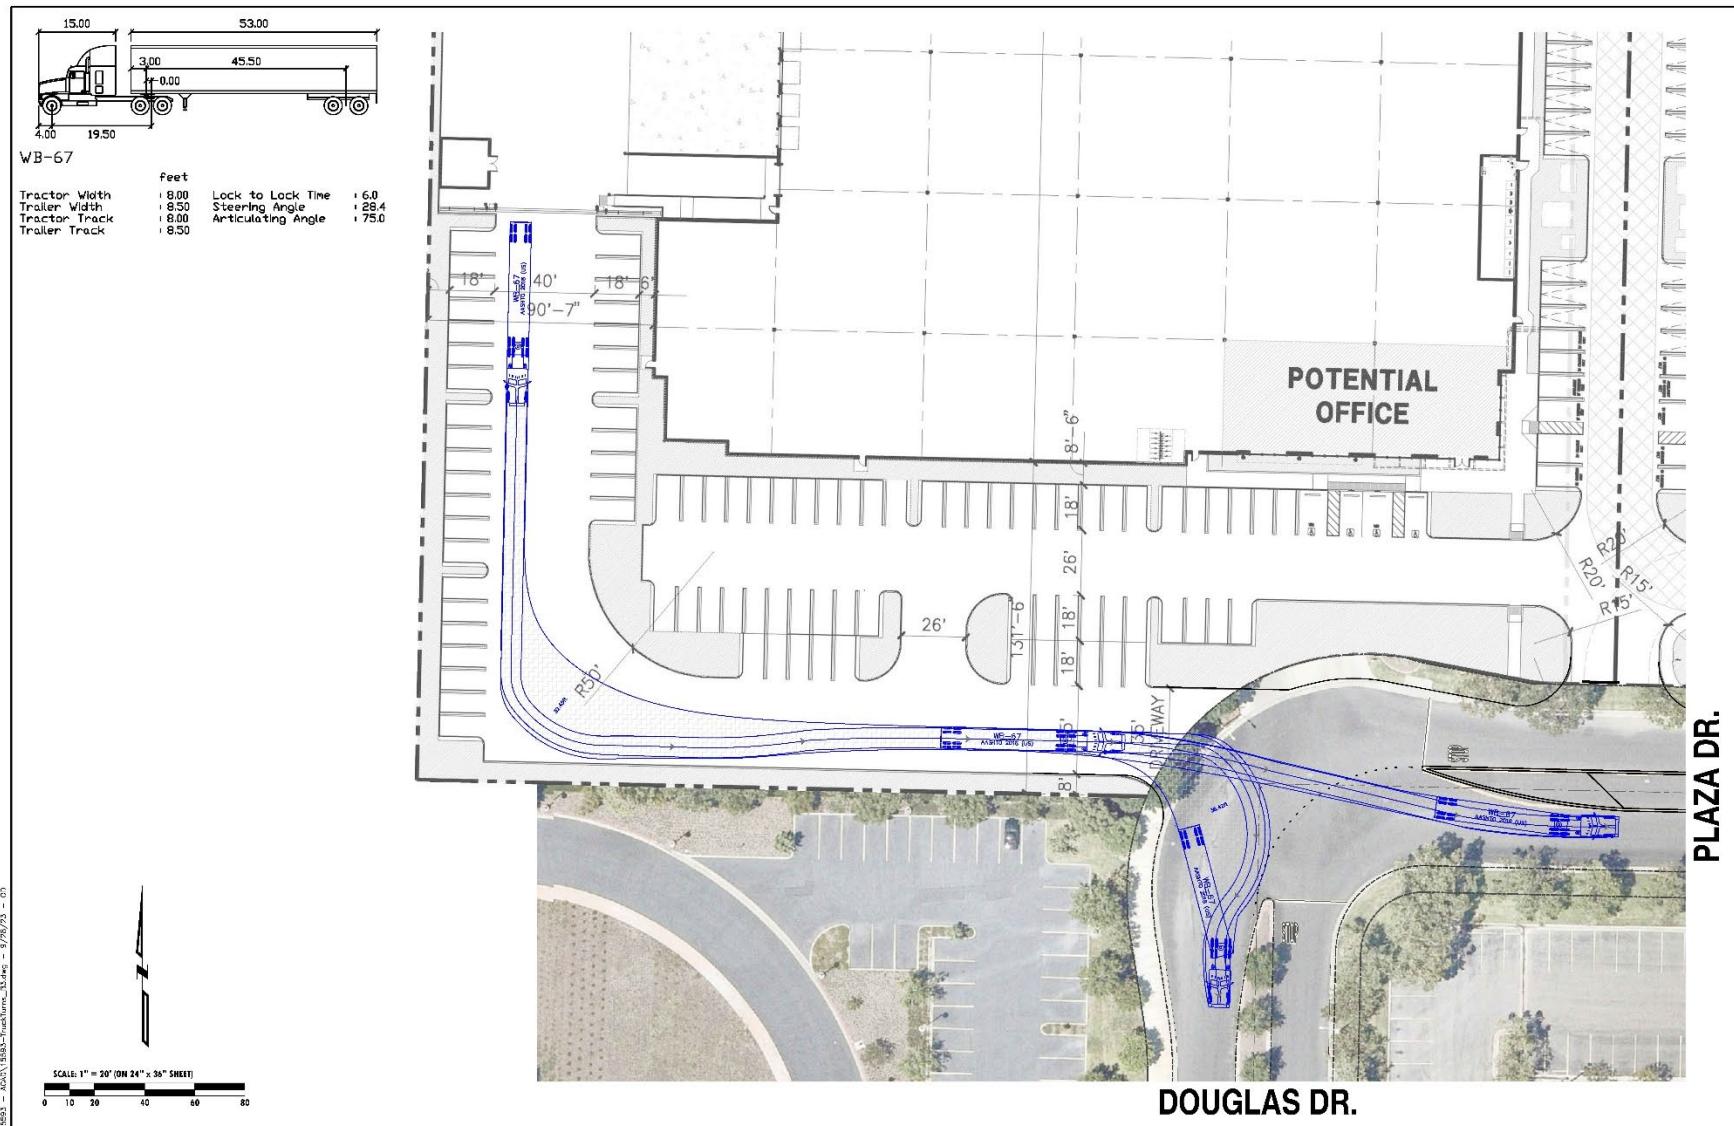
INBOUND TRUCK ACCESS AT DRIVEWAY 2
